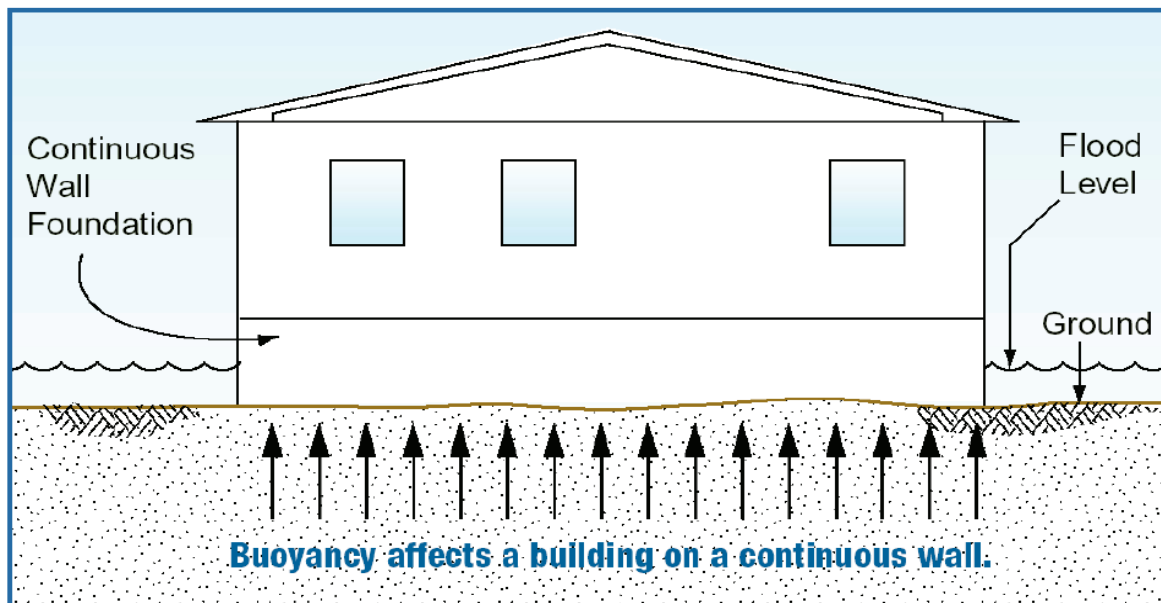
Hydrostatic Forces. A continuous wall foundation for a house does not allow venting of flood waters. Hydrostatic forces associated with the buoyancy of the house may lift the structure off its foundation and cause it to topple. From FEMA CCM.
